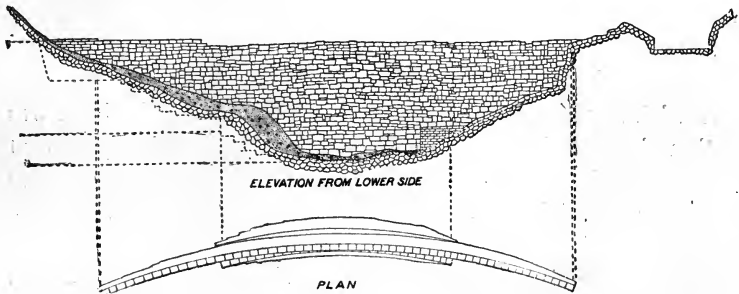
PLAN AND ELEVATION OF BEAR VALLEY DAM.
